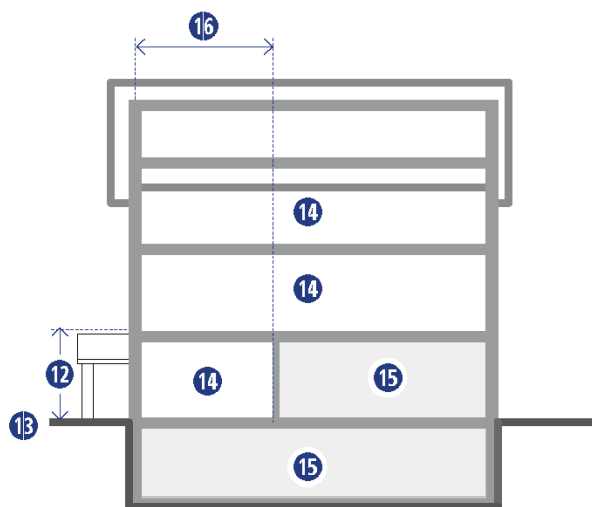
Detached House Building: Floor-to-Floor Height & Use Requirements
